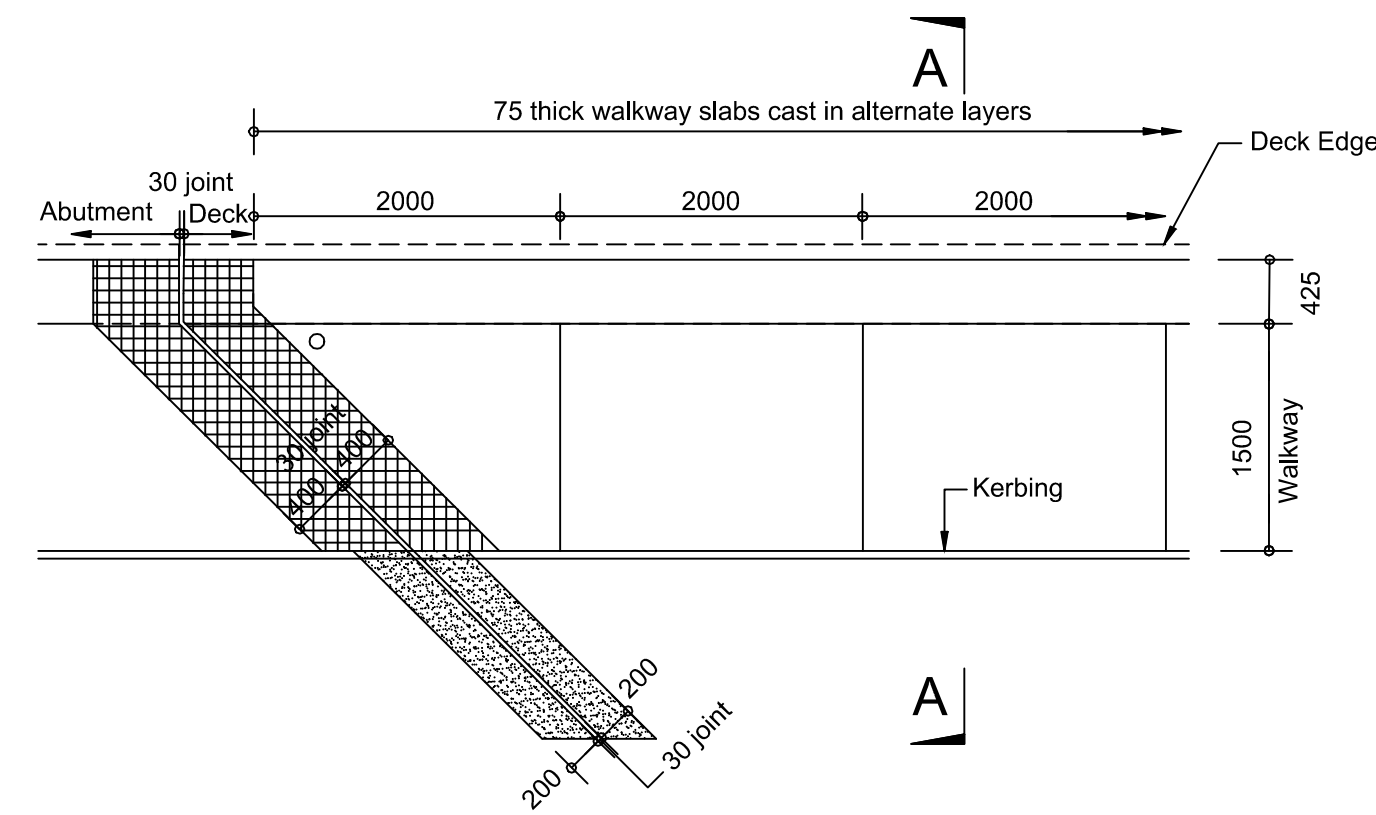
DETAIL OF uPVC SERVICE DUCTS ACROSS JOINTS
